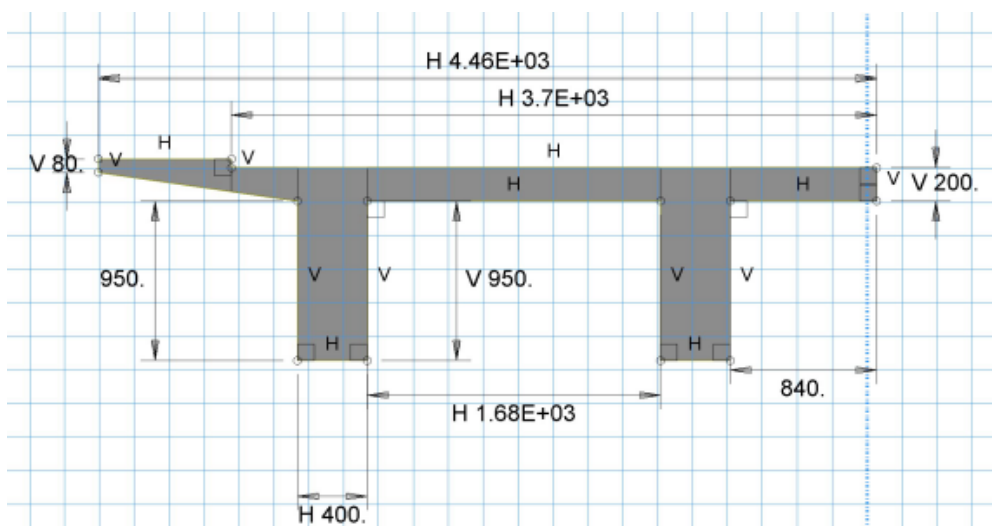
3: Bridge Cross sectional dimensions; as per field inspection measurement
